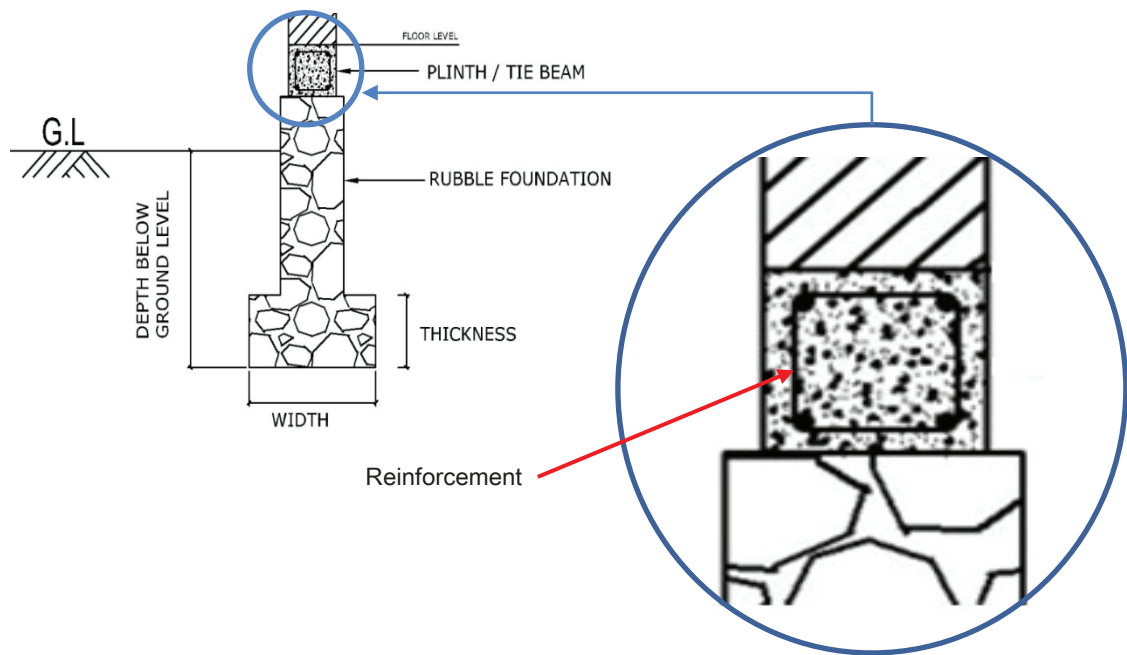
Plinth/Tie Beam on typical Wall Foundation Section (Rubble Masonry)
